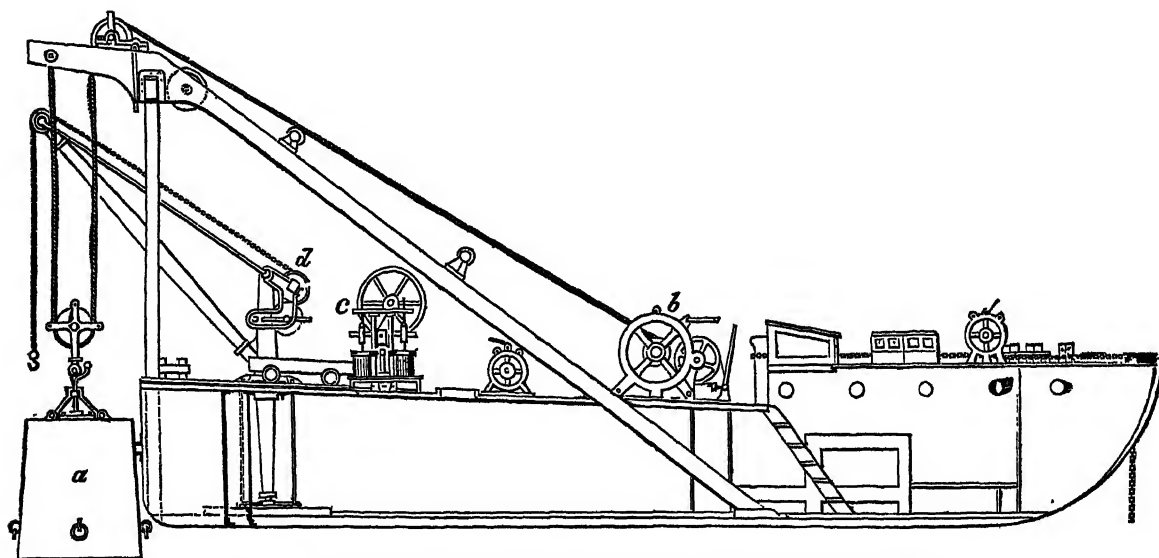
Longitudinal Section of Diving Bell Lighter (56 feet long and 24 feet beam).
